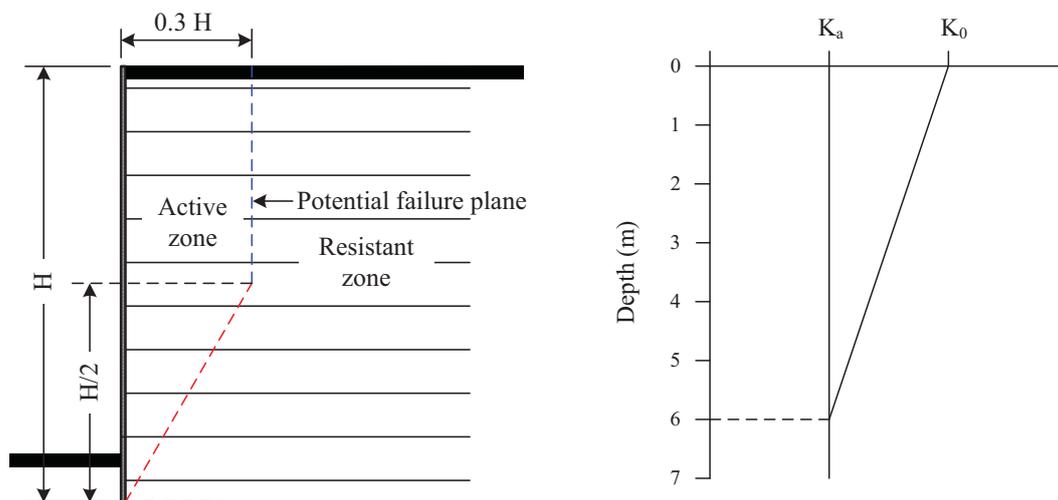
Failure plane and approximate K for bearing reinforcement earth wall (Horpibulsuk et al., 2010 and 2011 and Suksiripattanapong et al., 2012)
